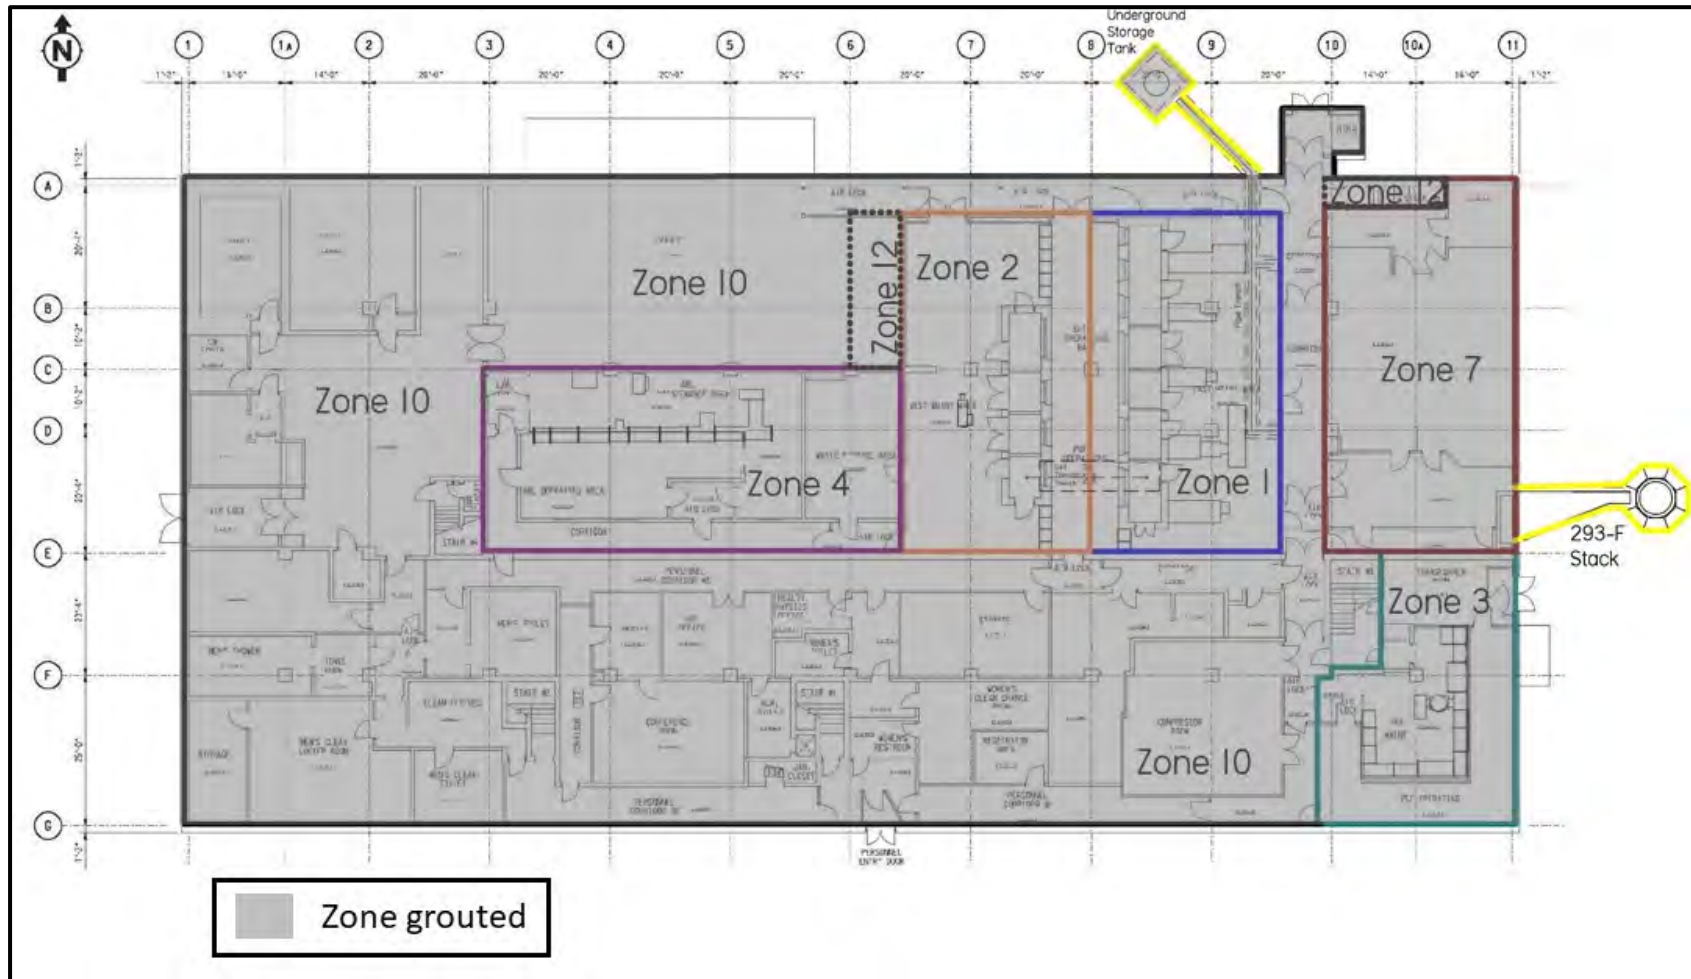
Alternative A-3 – ISD of Entire Building 235-F /Engineered Roof (First Level View)
